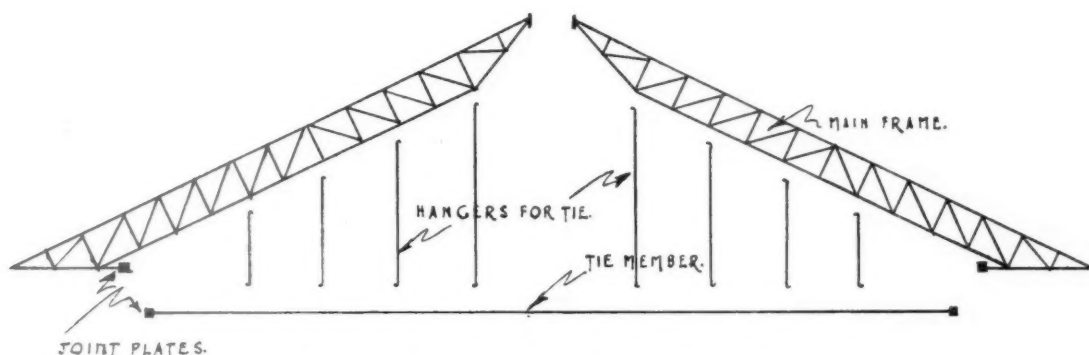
Composite roof truss for spans ranging from 30' to 120'.
